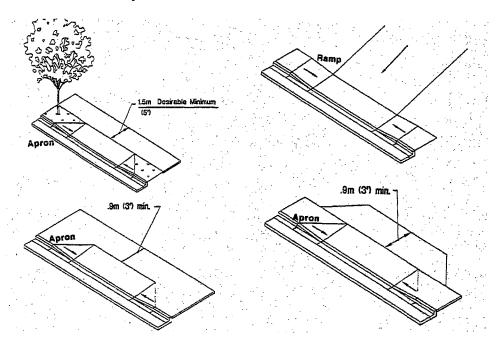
K Examples of Acceptable Driveway Openings Next to Sidewalks/Walkways
